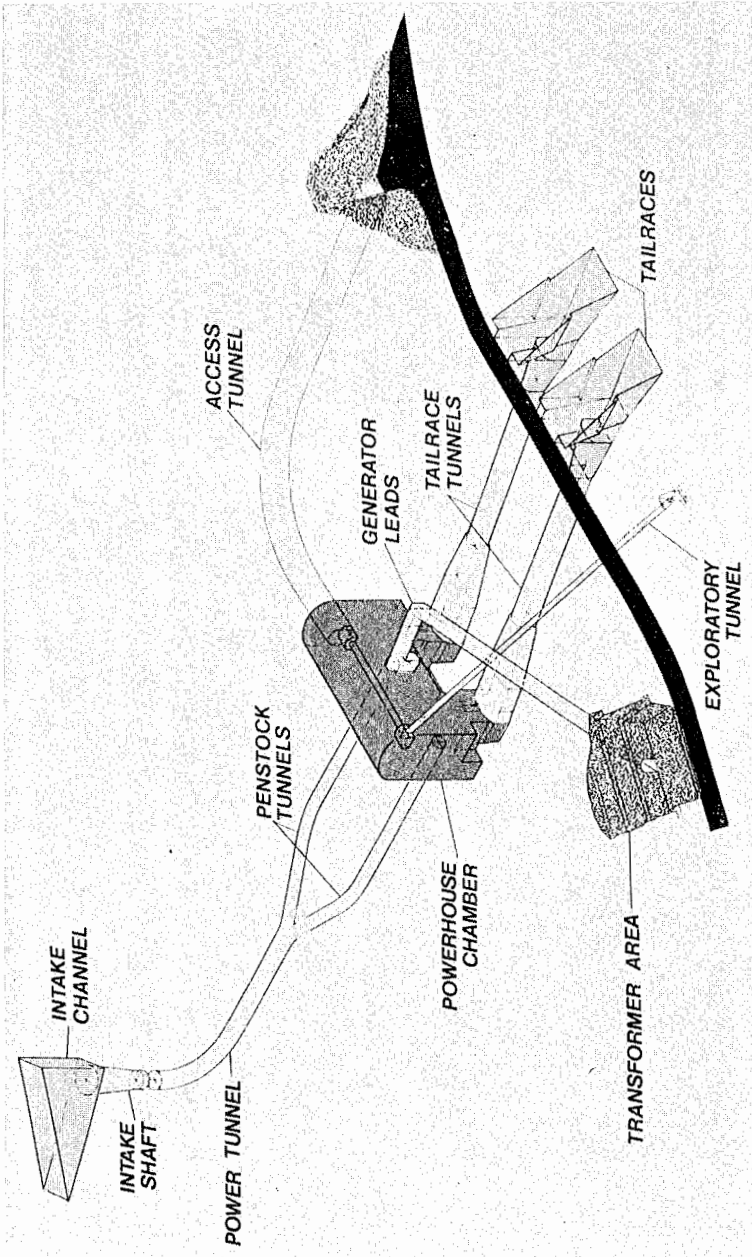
Schematic Diagram Underground Pumped Storage Project
